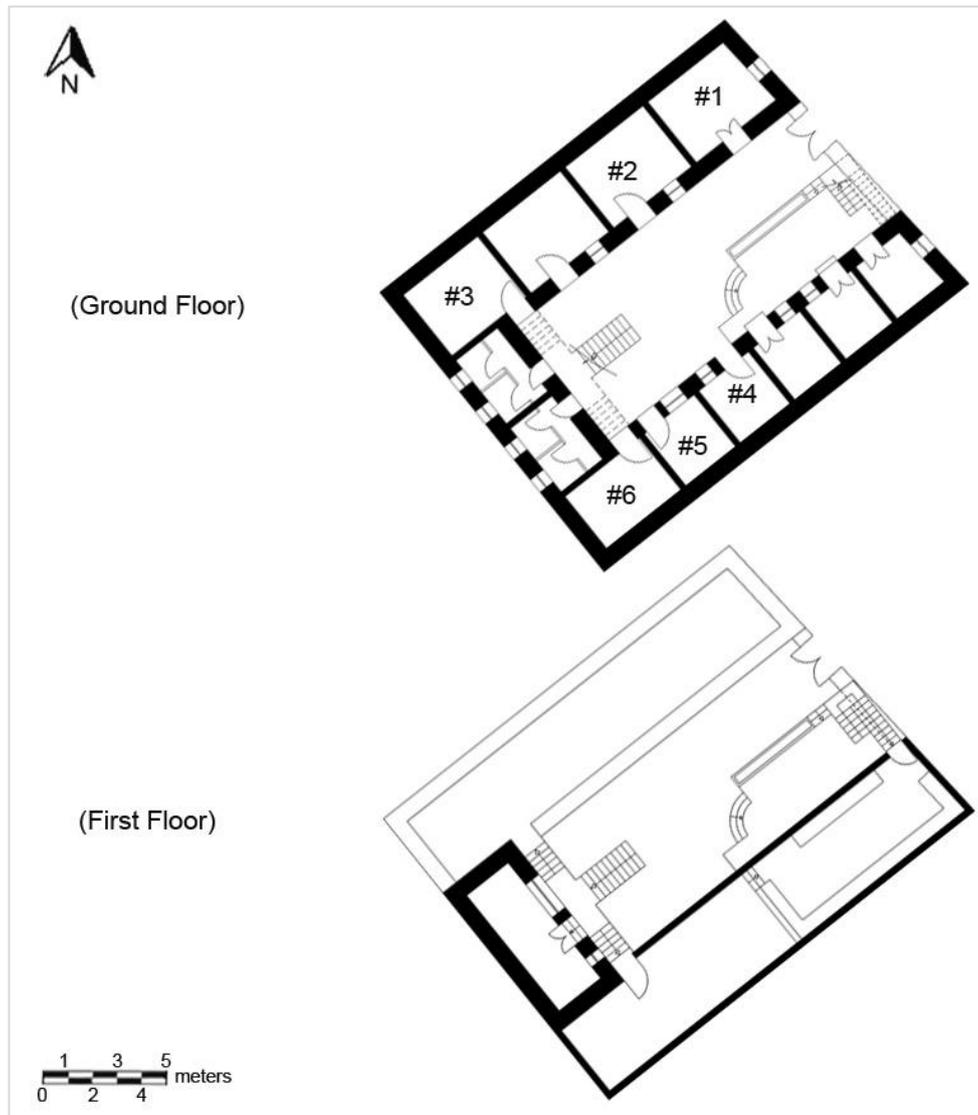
Ground floor plan (top) and first floor plan (bottom) of the original part of Dana hotel (Author 2020)
